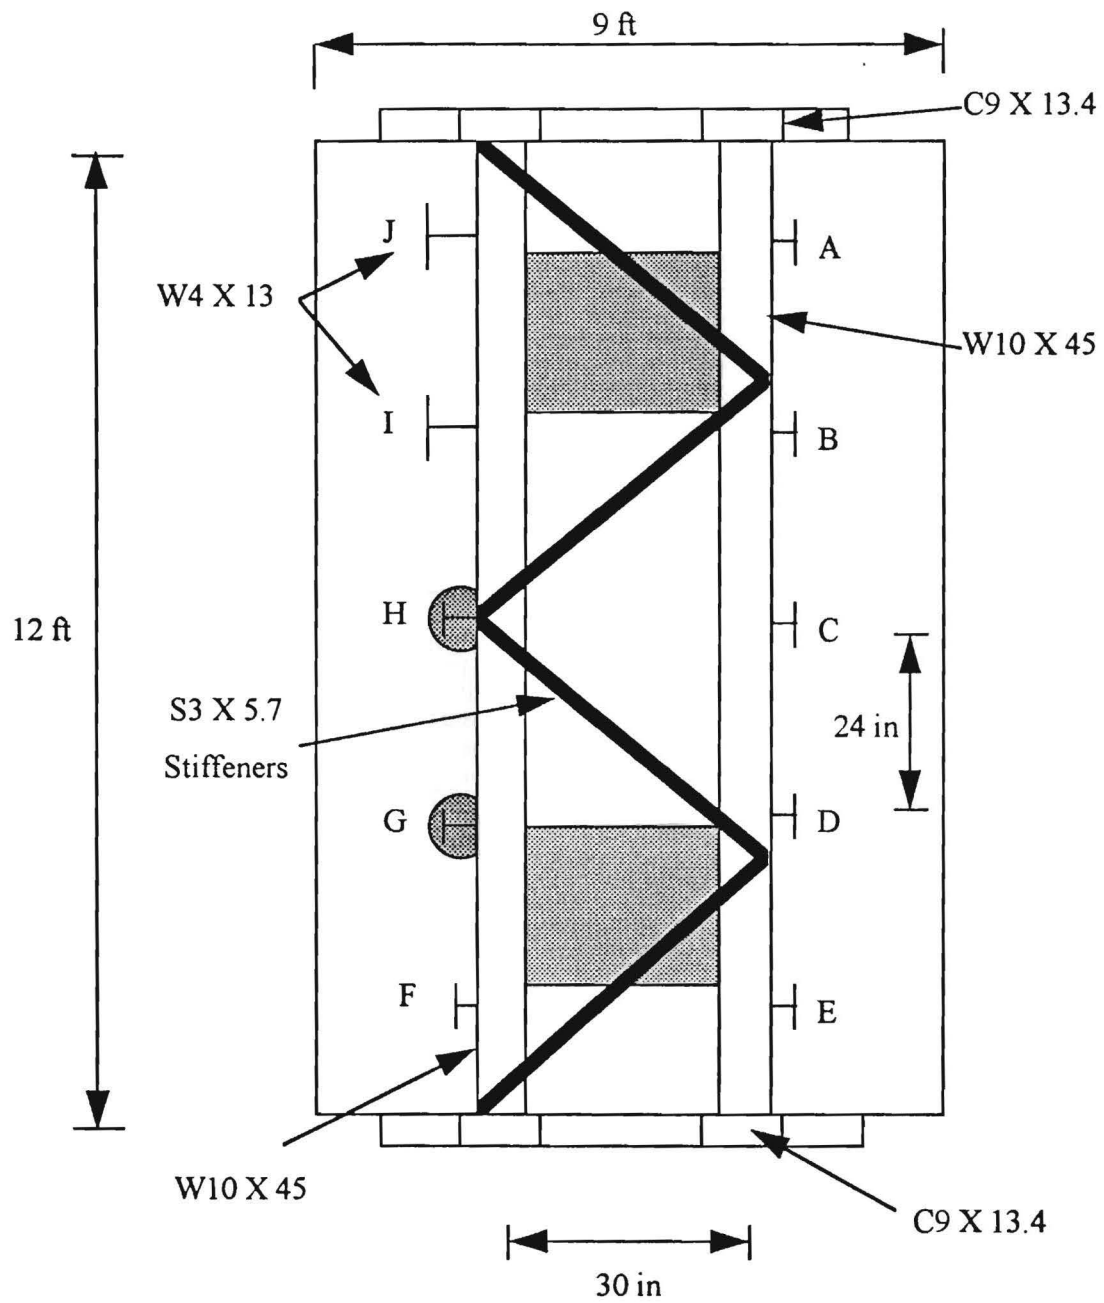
Plan View of Experimental Facility for Testing Small-Scale Piles
